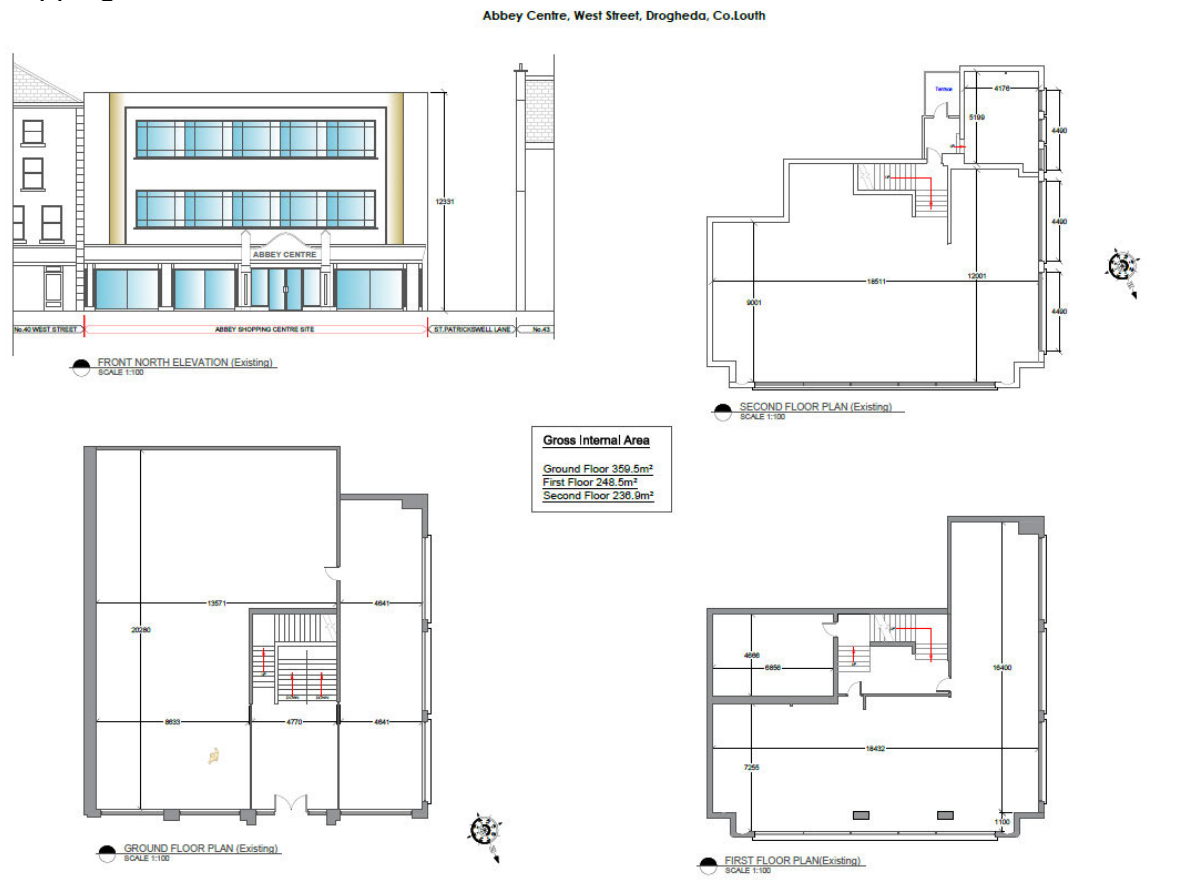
above – Existing Floor and front elevation plans of Abbey Centre Building West Street Drogheda which is subject to the Section 5 declaration.
